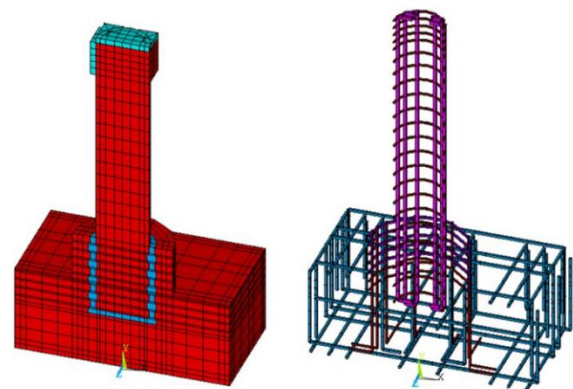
Concrete meshing and Steel Elements for tested specimen R-PE-48
